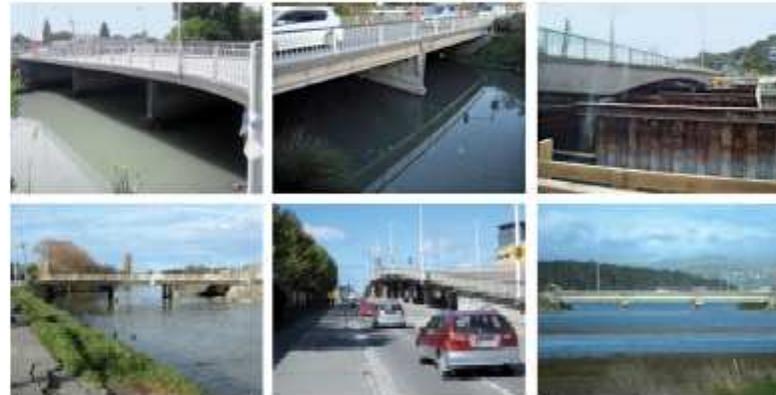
Overall views of some of the damaged bridges after 22 February 2011; clockwise from top left: Gayhurst Road Bridge, Fitzgerald Avenue Bridge, Farnham Bridge, Bridge Street Bridge, Worcester Avenue Bridge, Avondale Bridge
